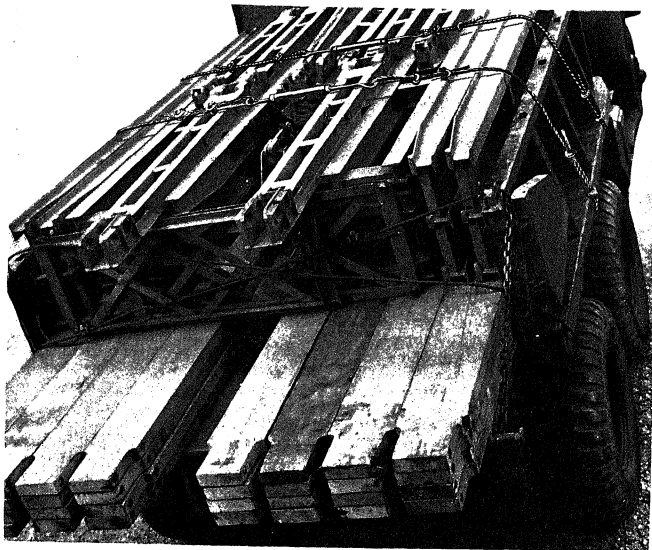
Truck load No. 6—Ramp load on 5-ton truck.
